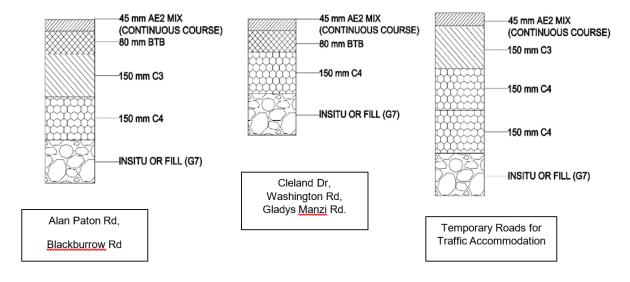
Pavement design structures for the other local roads and temporary roads
